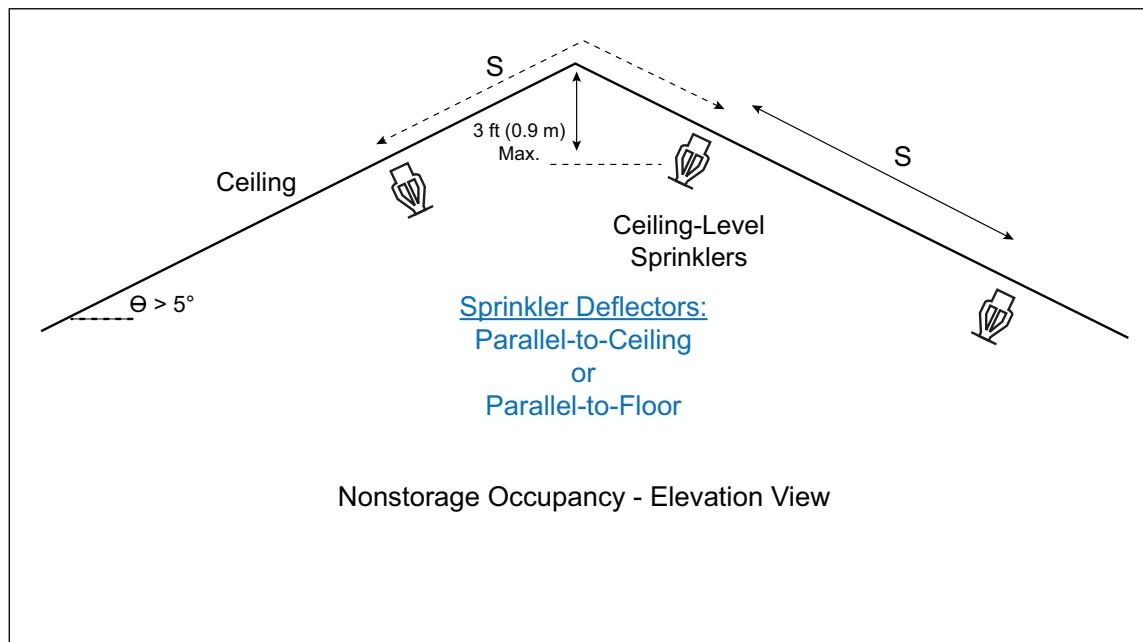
(b). Location of Nonstorage pendent and upright sprinklers near ceiling peak when slope exceeds 1 in 12 (5°)
